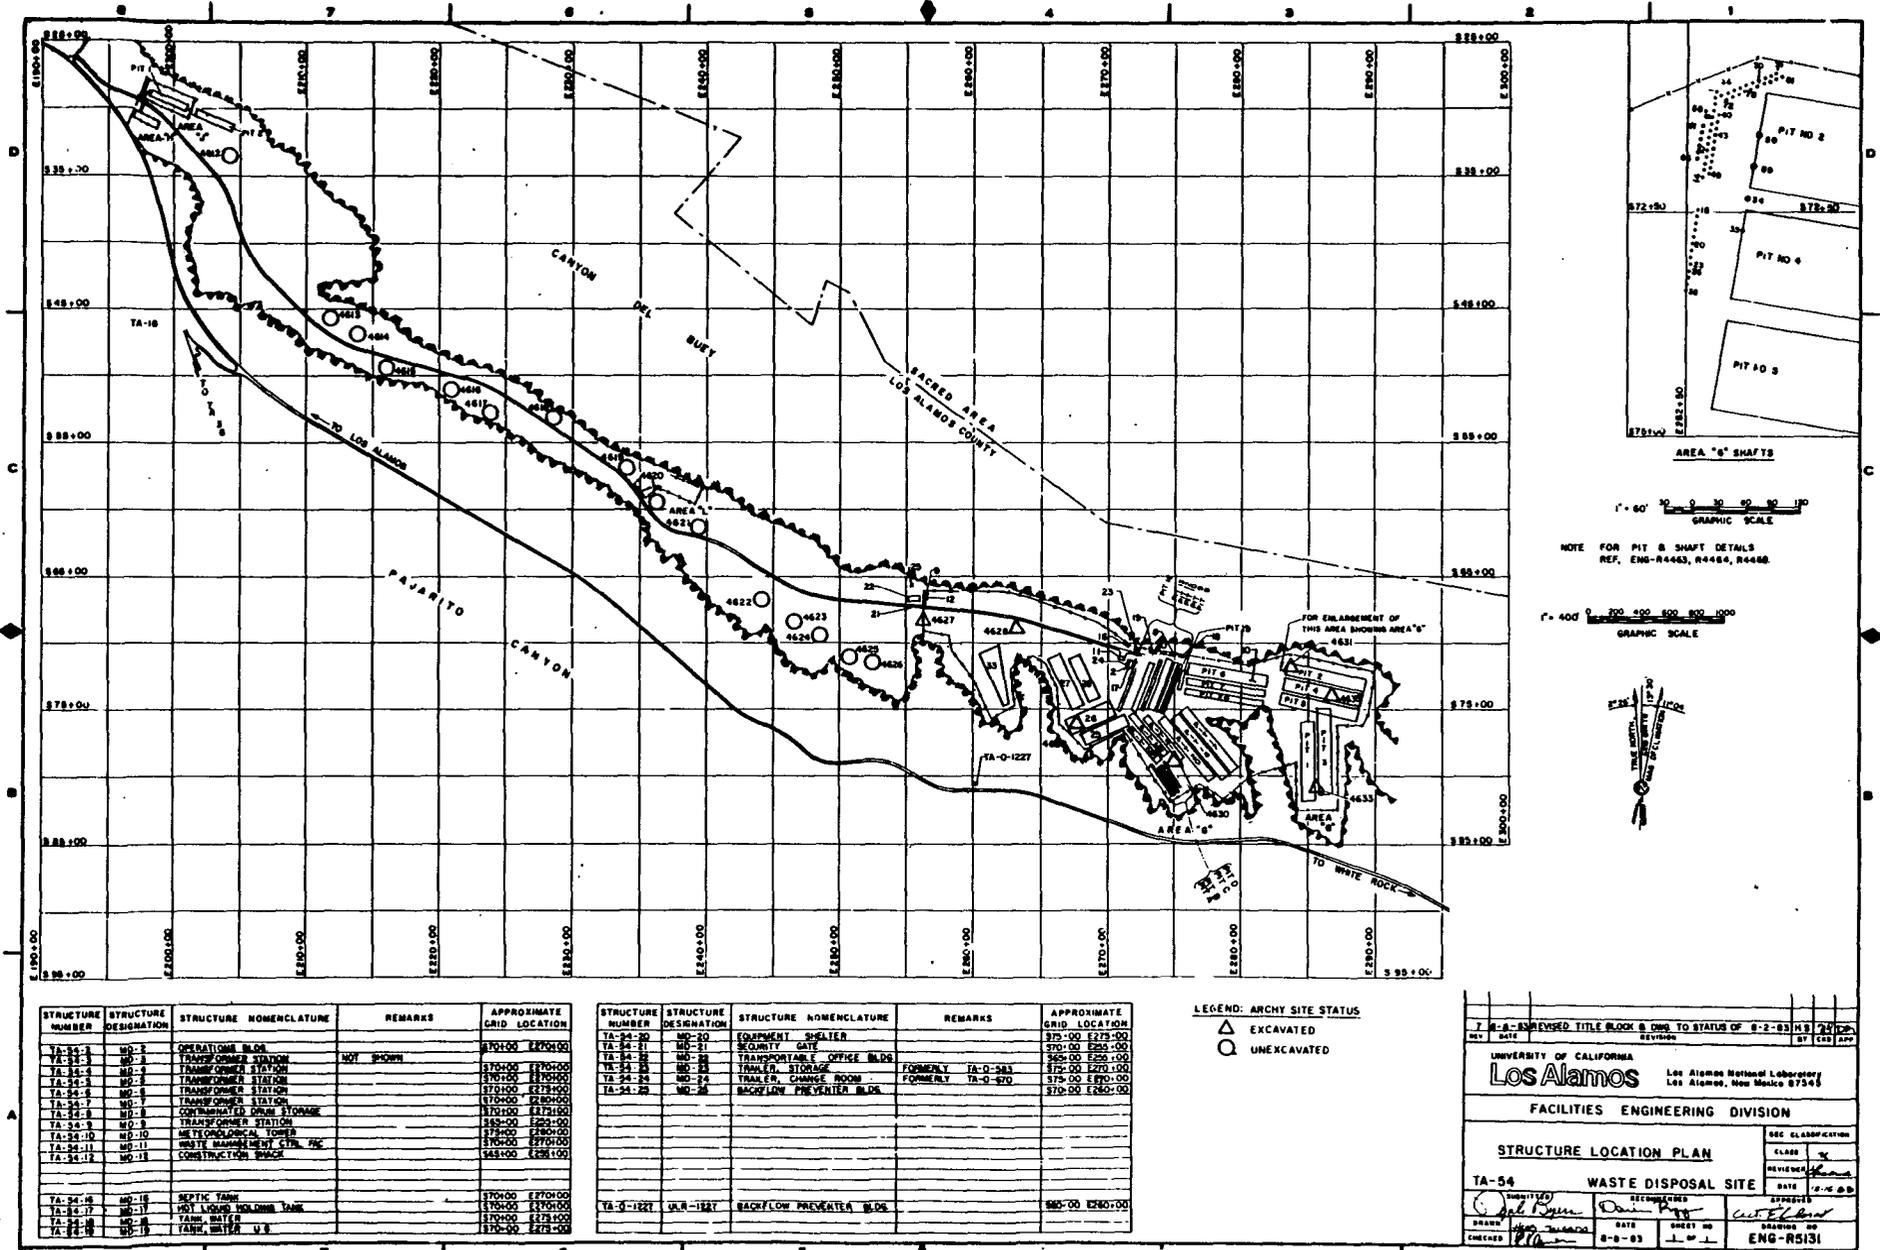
Structure Location Plan for TA-54 - Waste Disposal Site (1983 Drawing from the LANL Technical Area Structure Location Plans)
